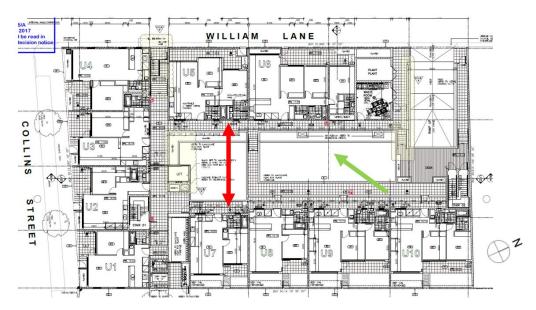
approved floor plans for apartments within 21-27 William Street, showing genuine deep soil, outward-facing living areas and no opposing windows
